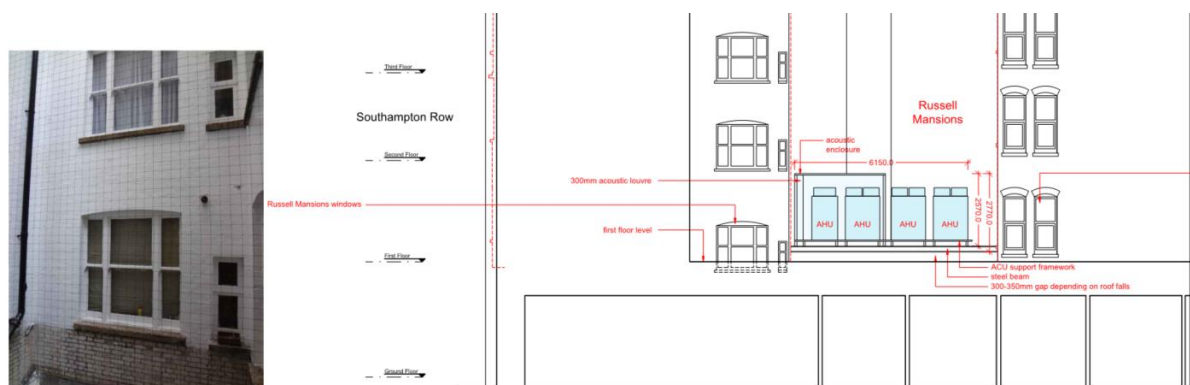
Proposed south east elevation showing condensers and location of neighbouring residential windows within Russell Square Mansions
